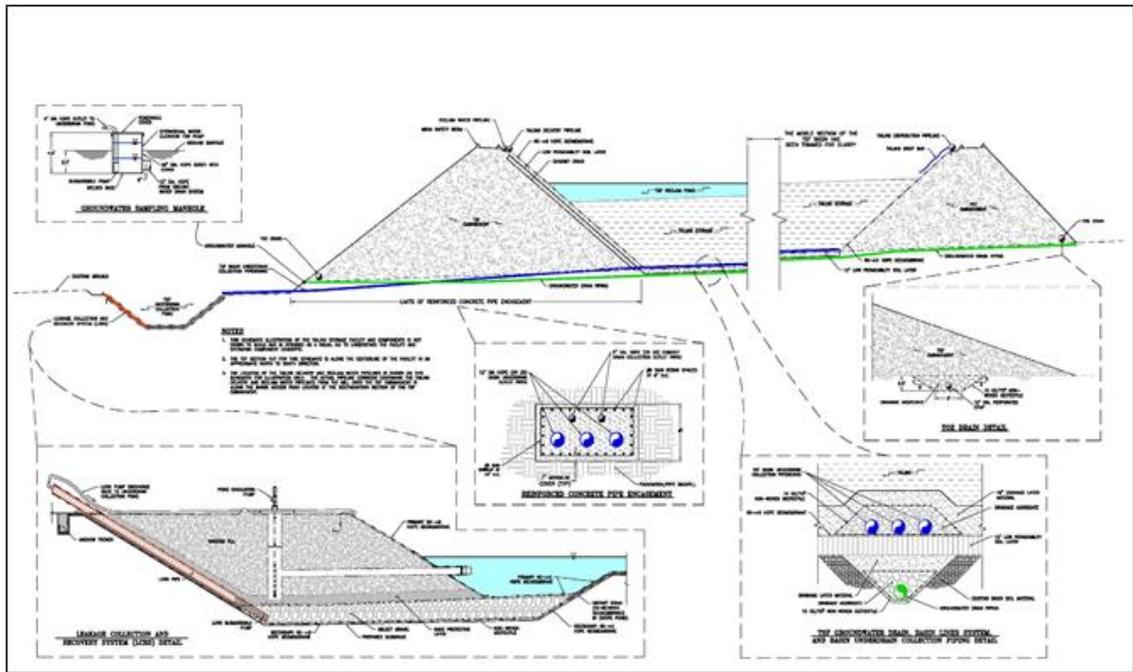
Cross Section of TSF Groundwater Drain and Seepage Collection System
